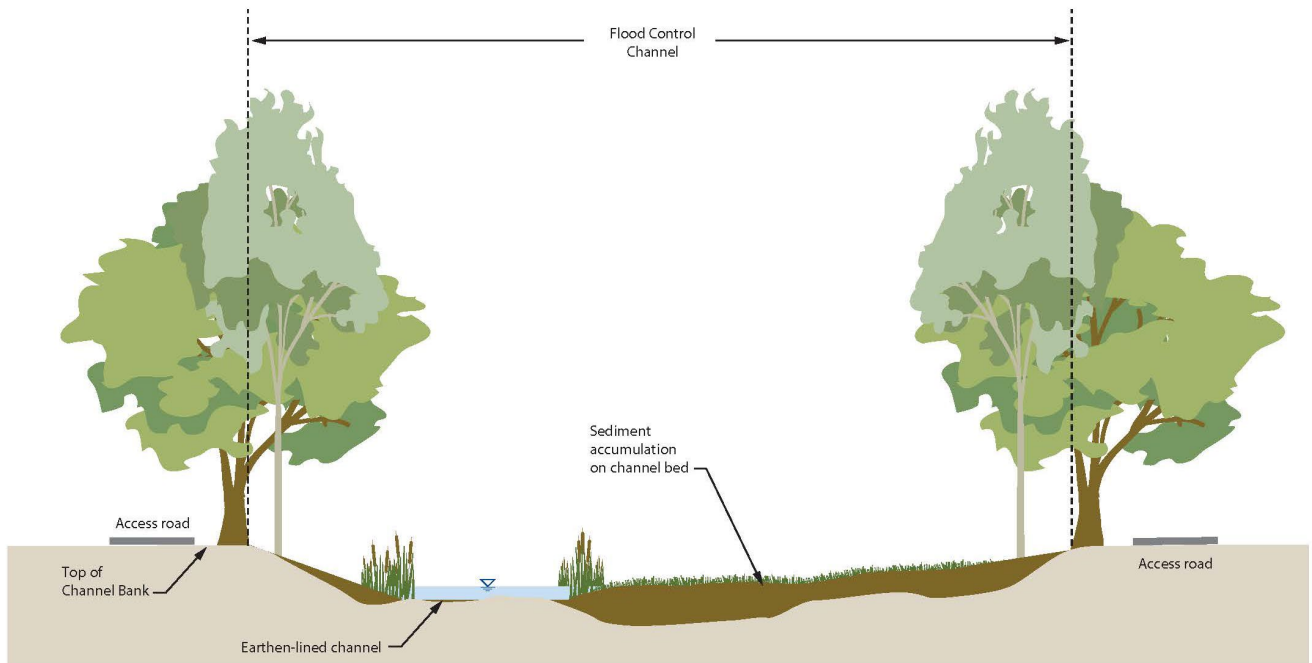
Typical cross-section of a nonengineered, earthen-lined channel
